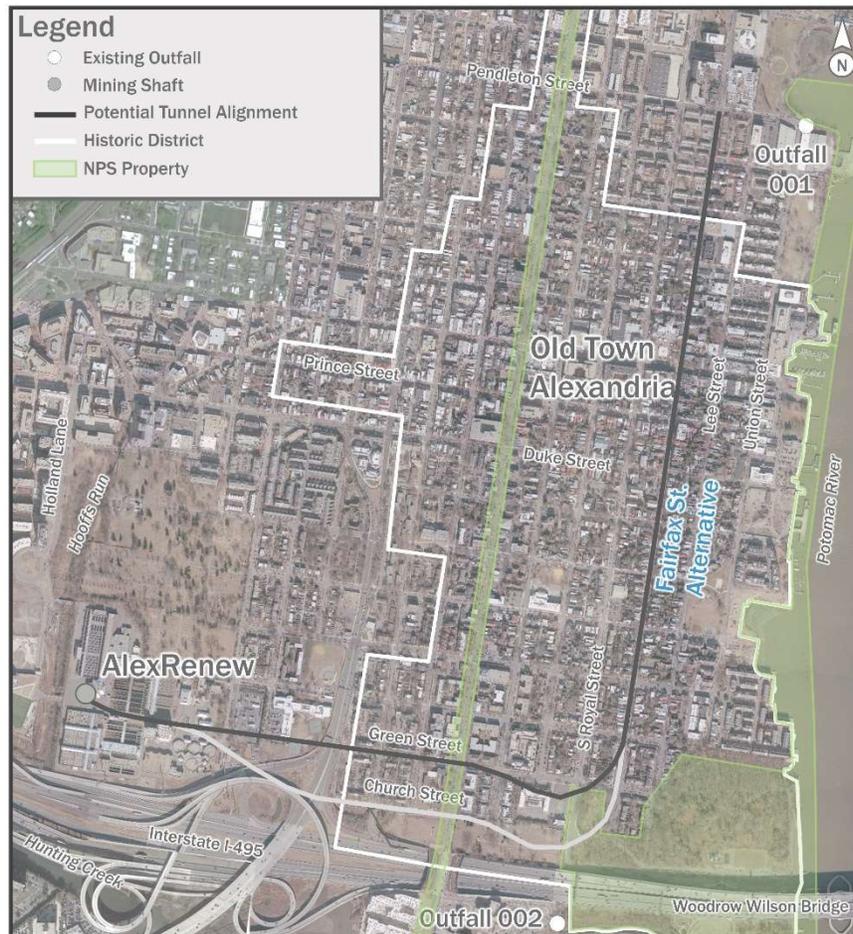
Fairfax Street Dismissed Tunnel Alignment Option
